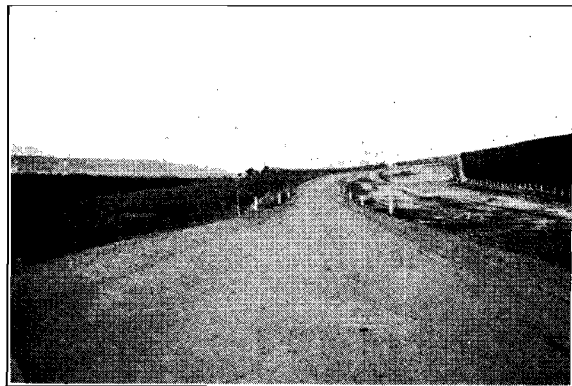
Showing new section of Murray Valley Highway beyond Tallangatta.
